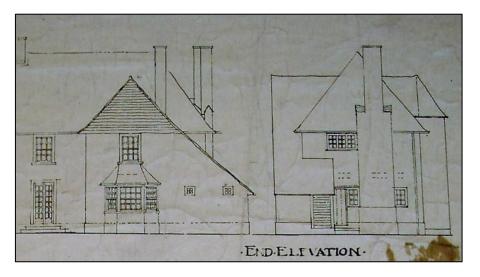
Rear and side elevations of 115 Willifield Way, 1909 (Hampstead Garden Suburb Trust)
